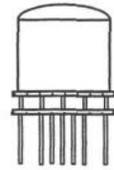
The design elevation diagram of the tank, deck, pile cap, and piling.
